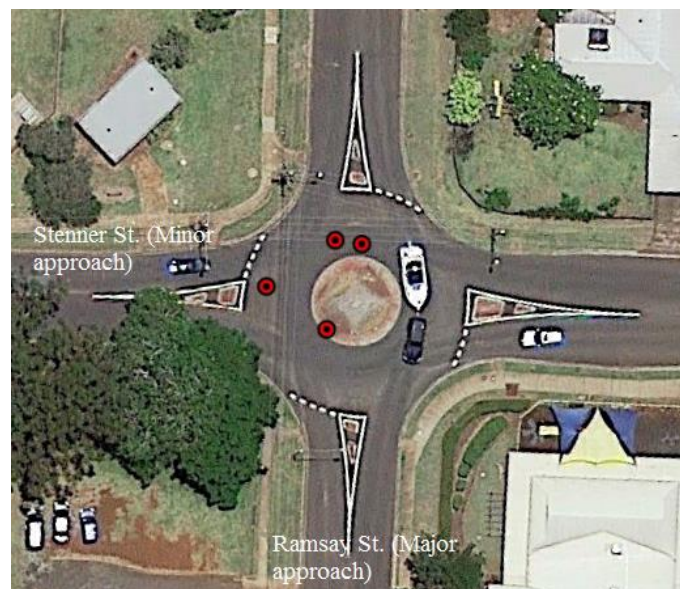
Roundabout R_SE6 between Ramsay Street and Stenner Street
